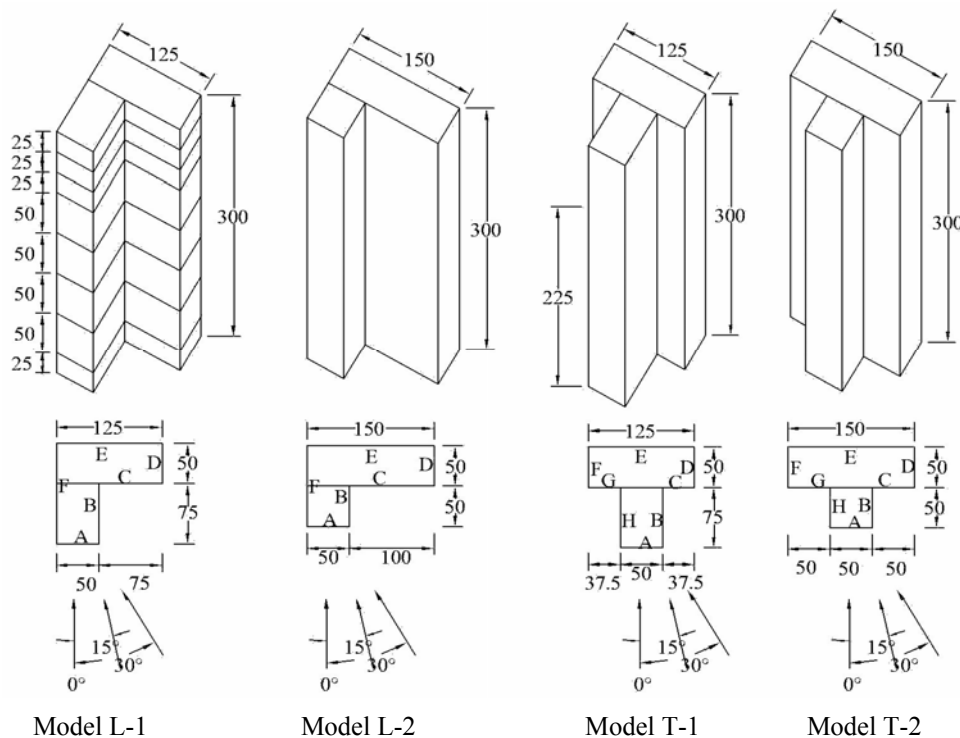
(a) Plan and isometric views of building models (Dimensions in mm)
